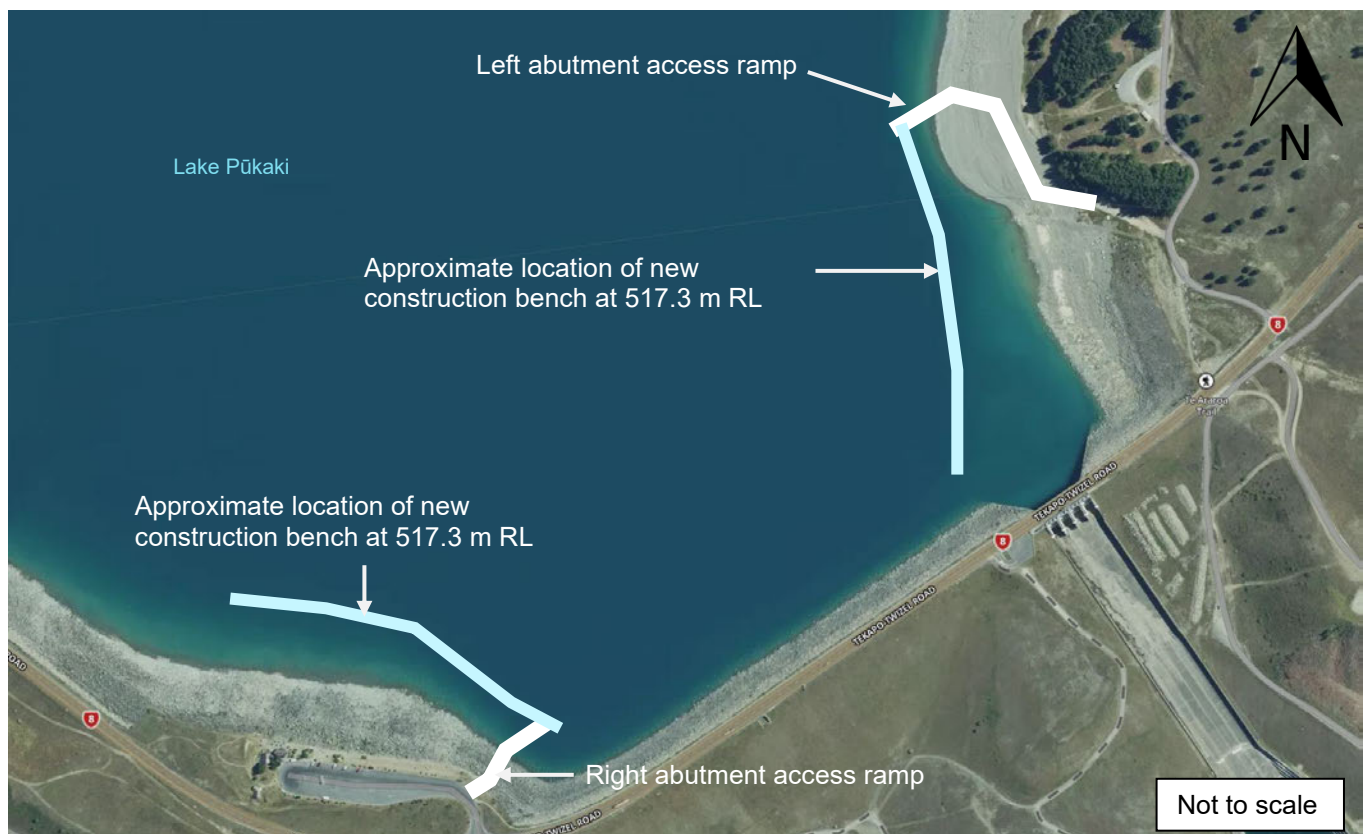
Site plan (abutments) and indicative 517.3 m RL construction bench
